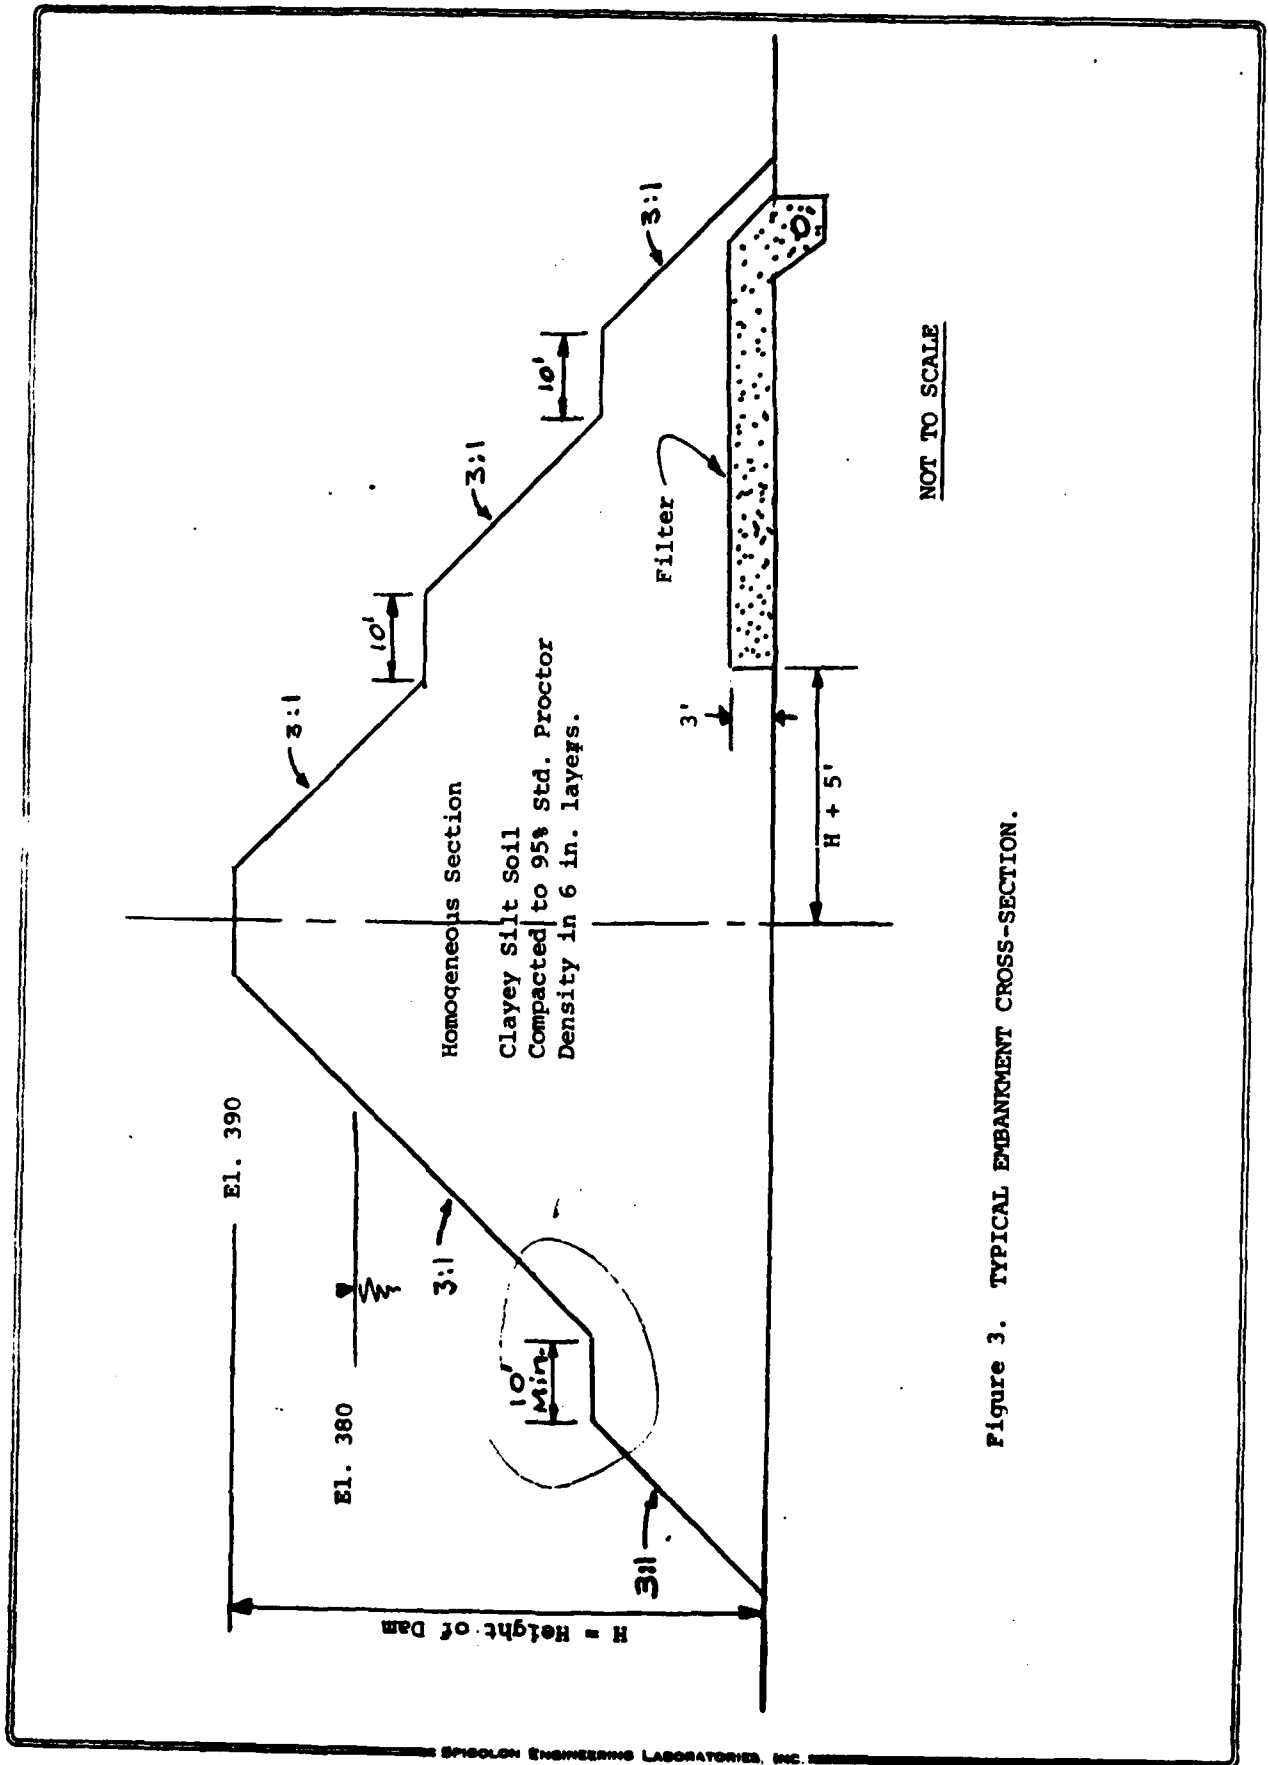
TYPICAL EMBANKMENT CROSS-SECTION.
